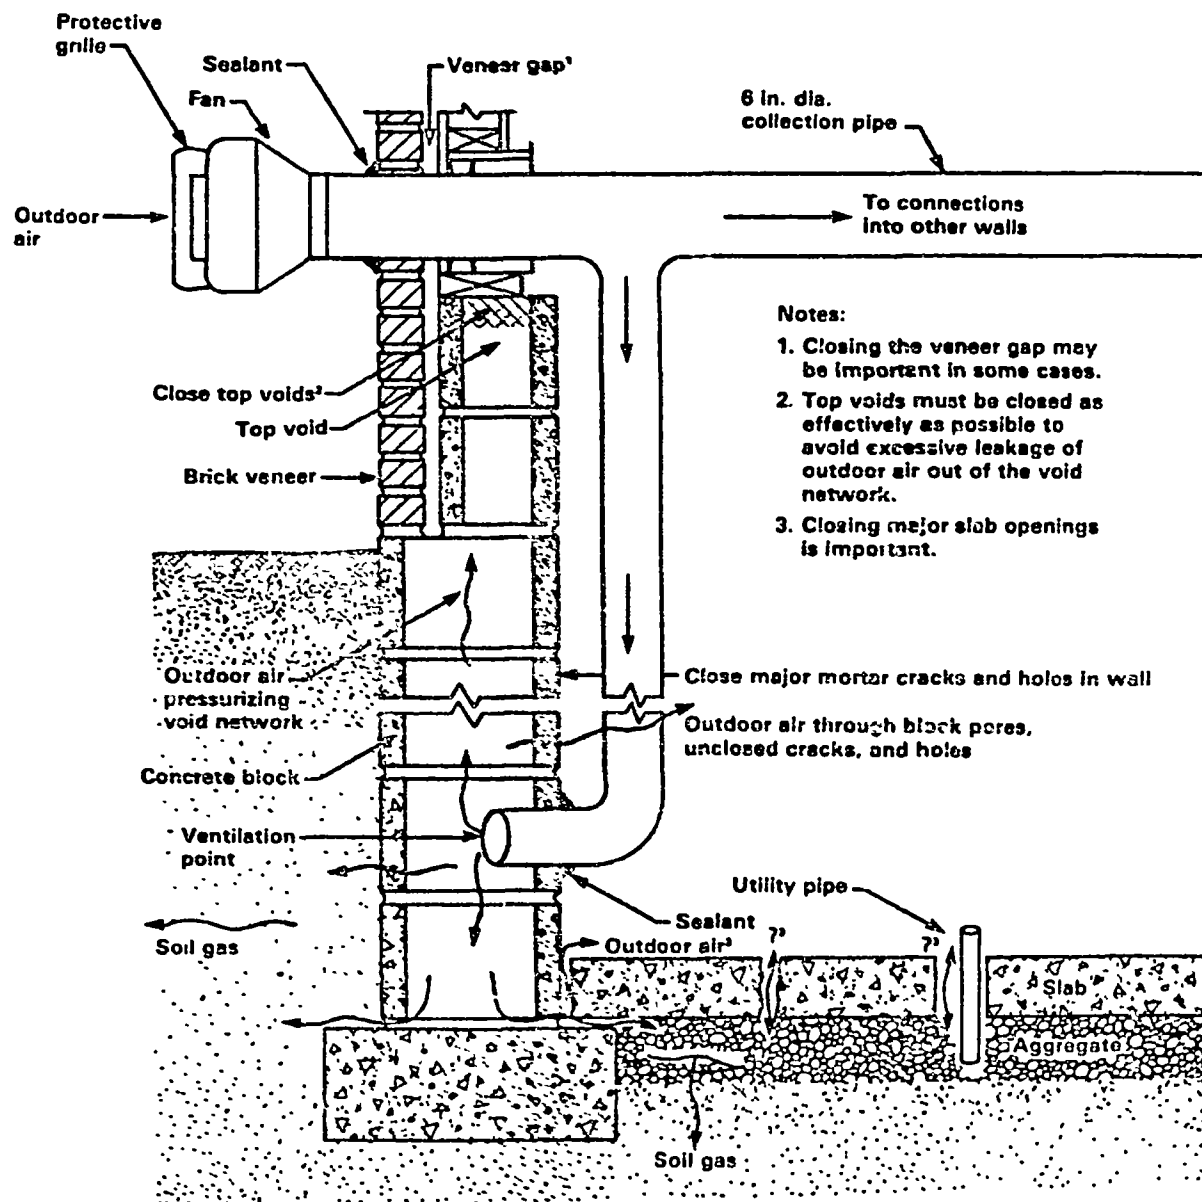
TYPICAL WALL VENTILATION SYSTEM
